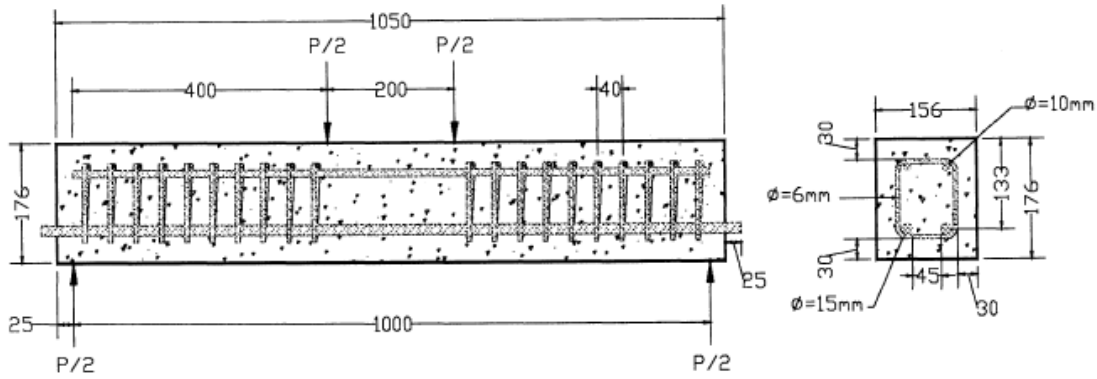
Geometry of a typical beam specimen used in Smith (2007)
